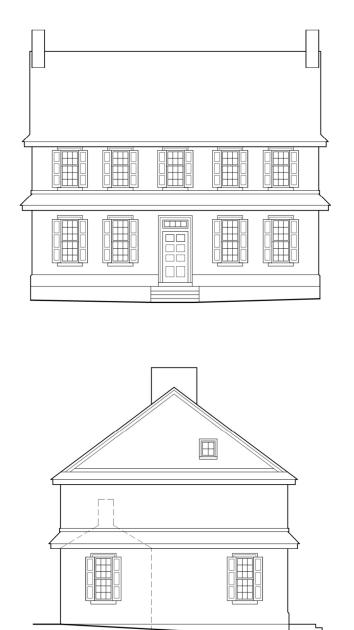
Robert Barber house in Wright's Ferry, reconstruction of original west facing front and north gable elevations, showing pent roof over first floor windows and steep slope of the original roof.
